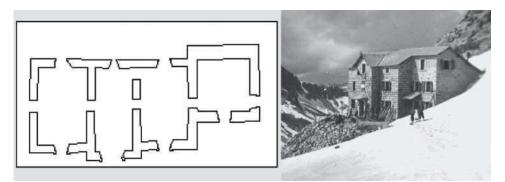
The refuge after 1922, plan and photos (C.A.I. Archives of Brescia).
